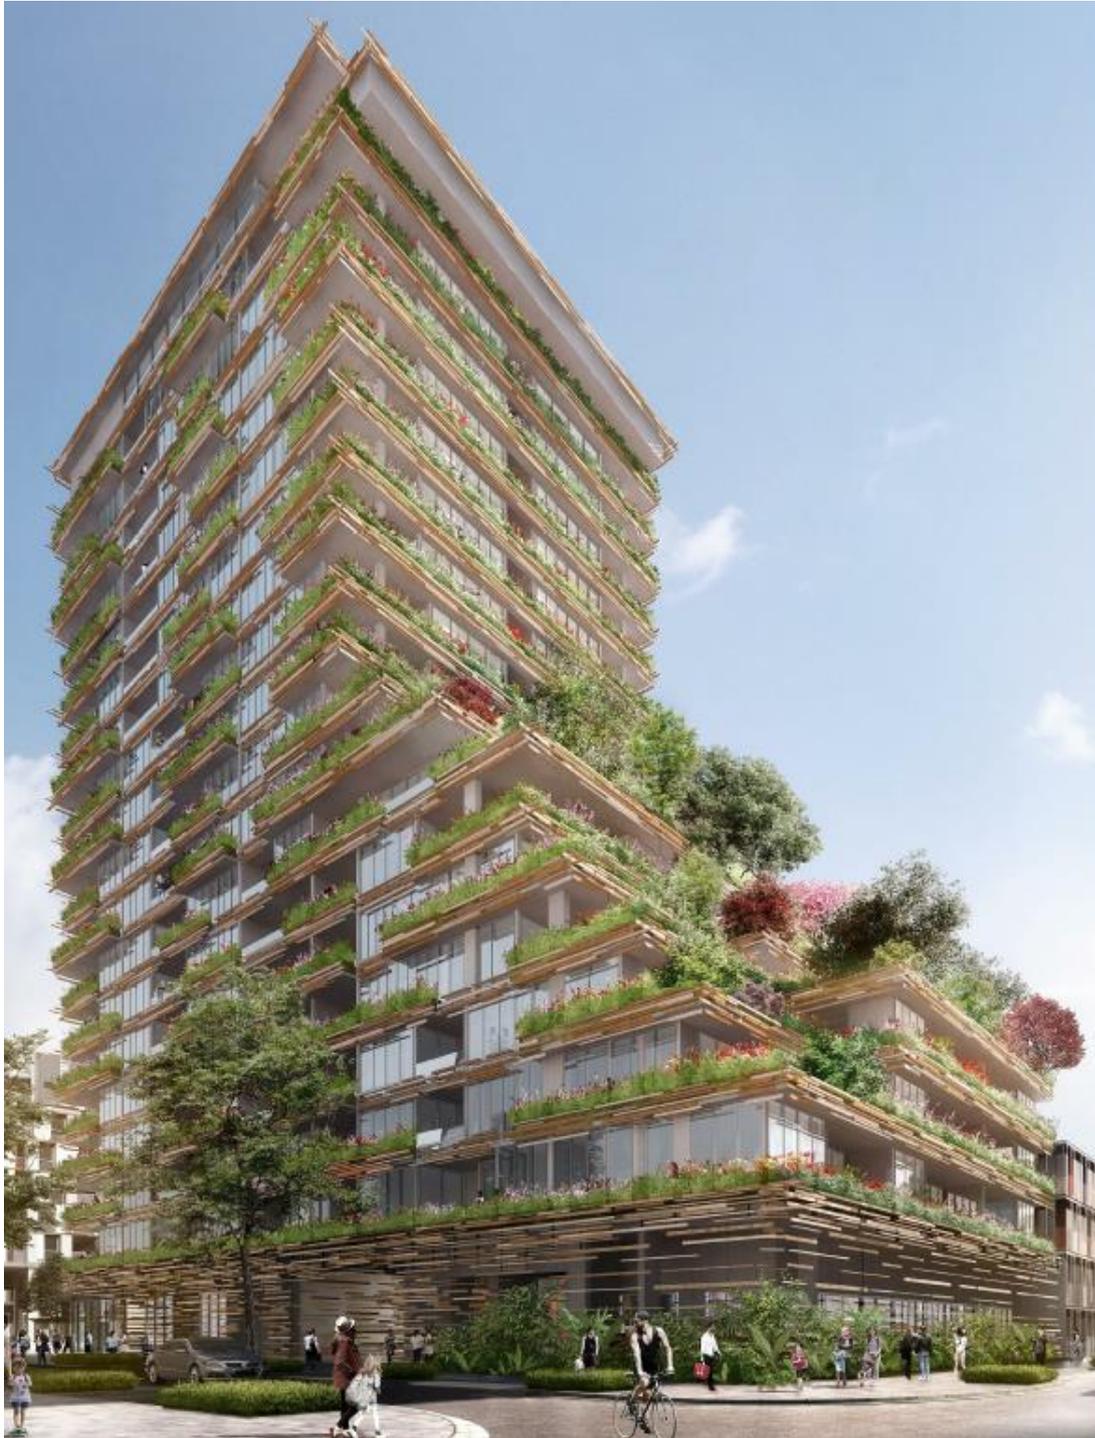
A photomontage of the north and east elevations, from the future intersection of Reed Street and Hatbox Place
